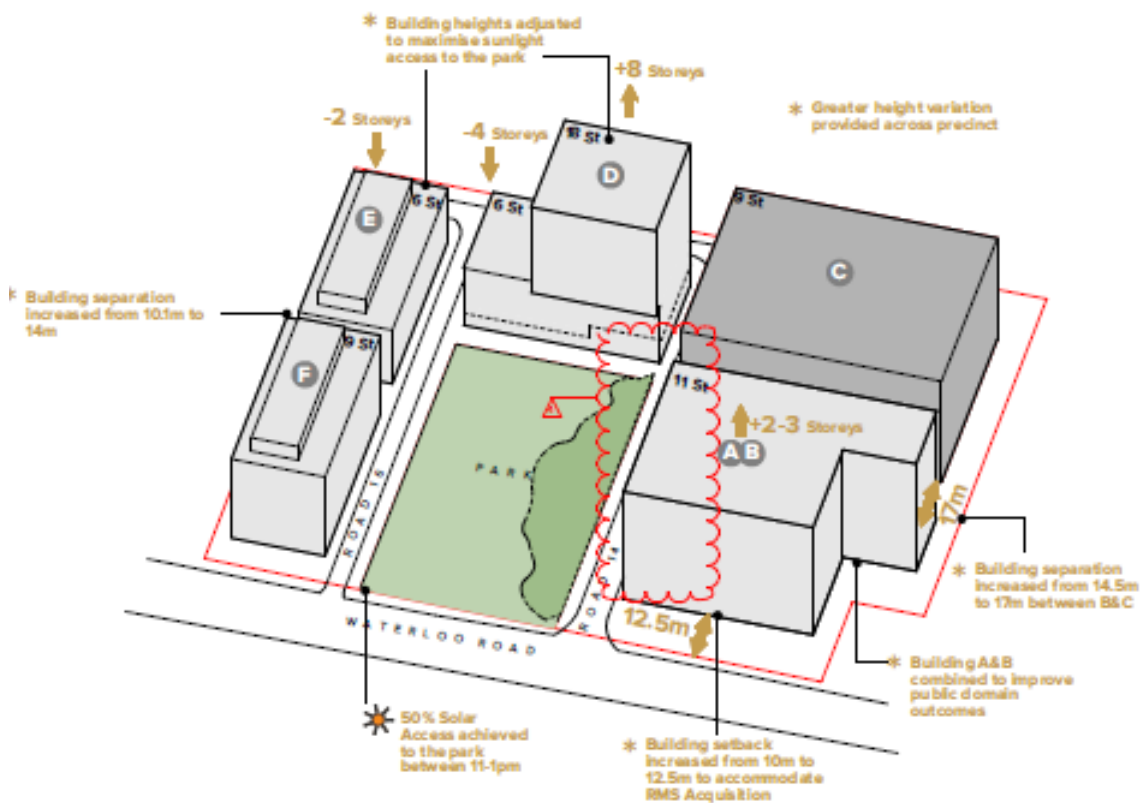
Concept plan approval demonstrating the overall bulk and scale. The current building is Building AB.
